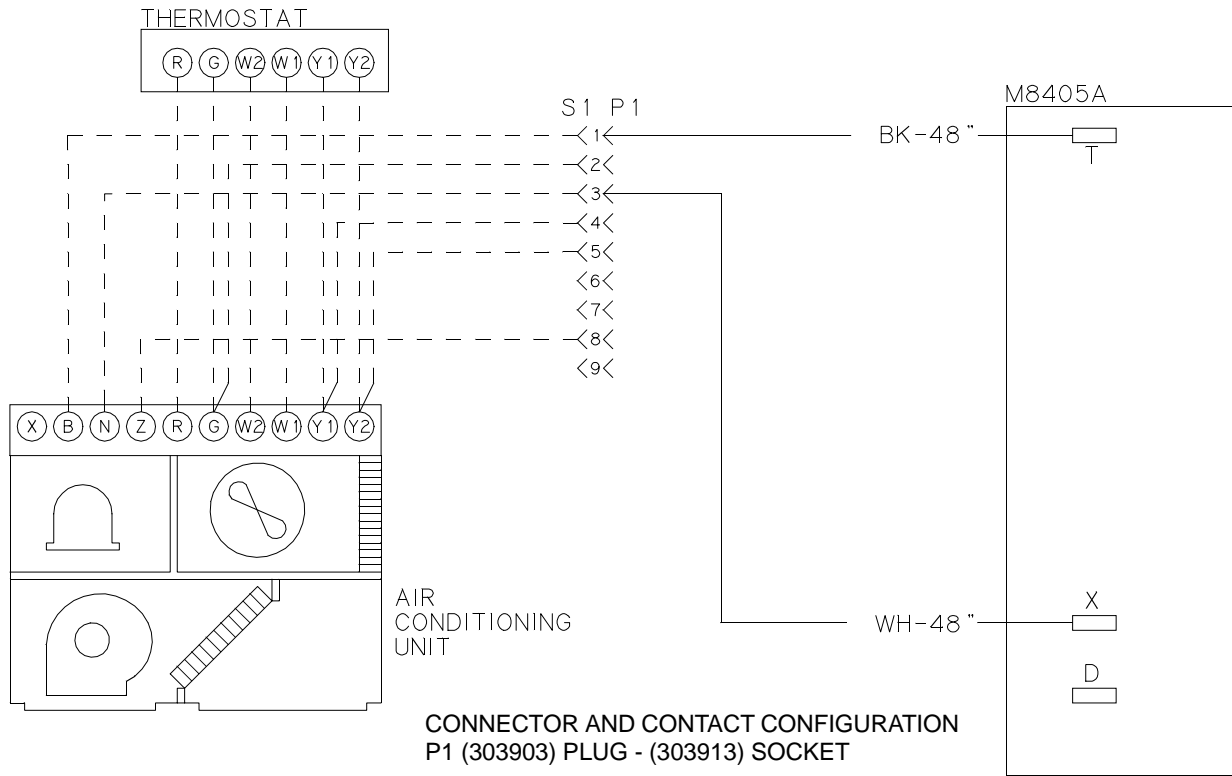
MOTORIZED OUTDOOR AIR DAMPER WIRING DIAGRAM
